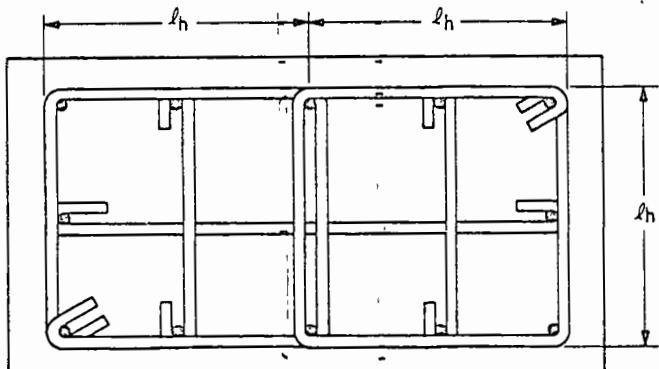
Sectional view of hoop column showing overlapping hoops and supplementary ties
